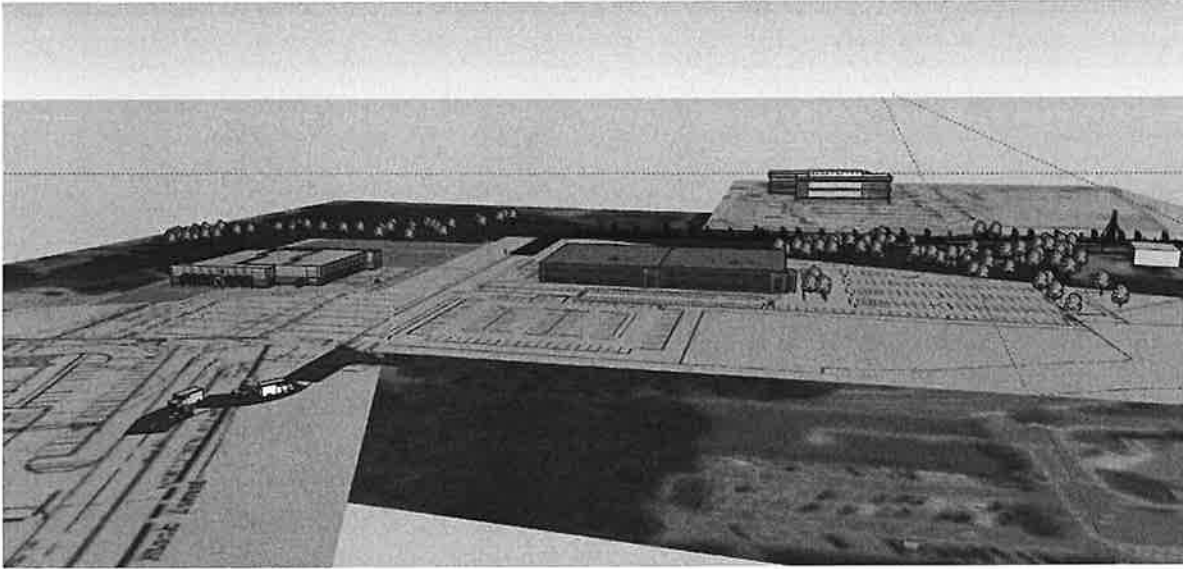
Overhead view of Concept Plan facing southwest showing new VA clinic and post office in the center accessed by a new Castlebuono-Salerno Avenue to Caudina Avenue, and the new County Social Services Building in the upper right hand corner.
